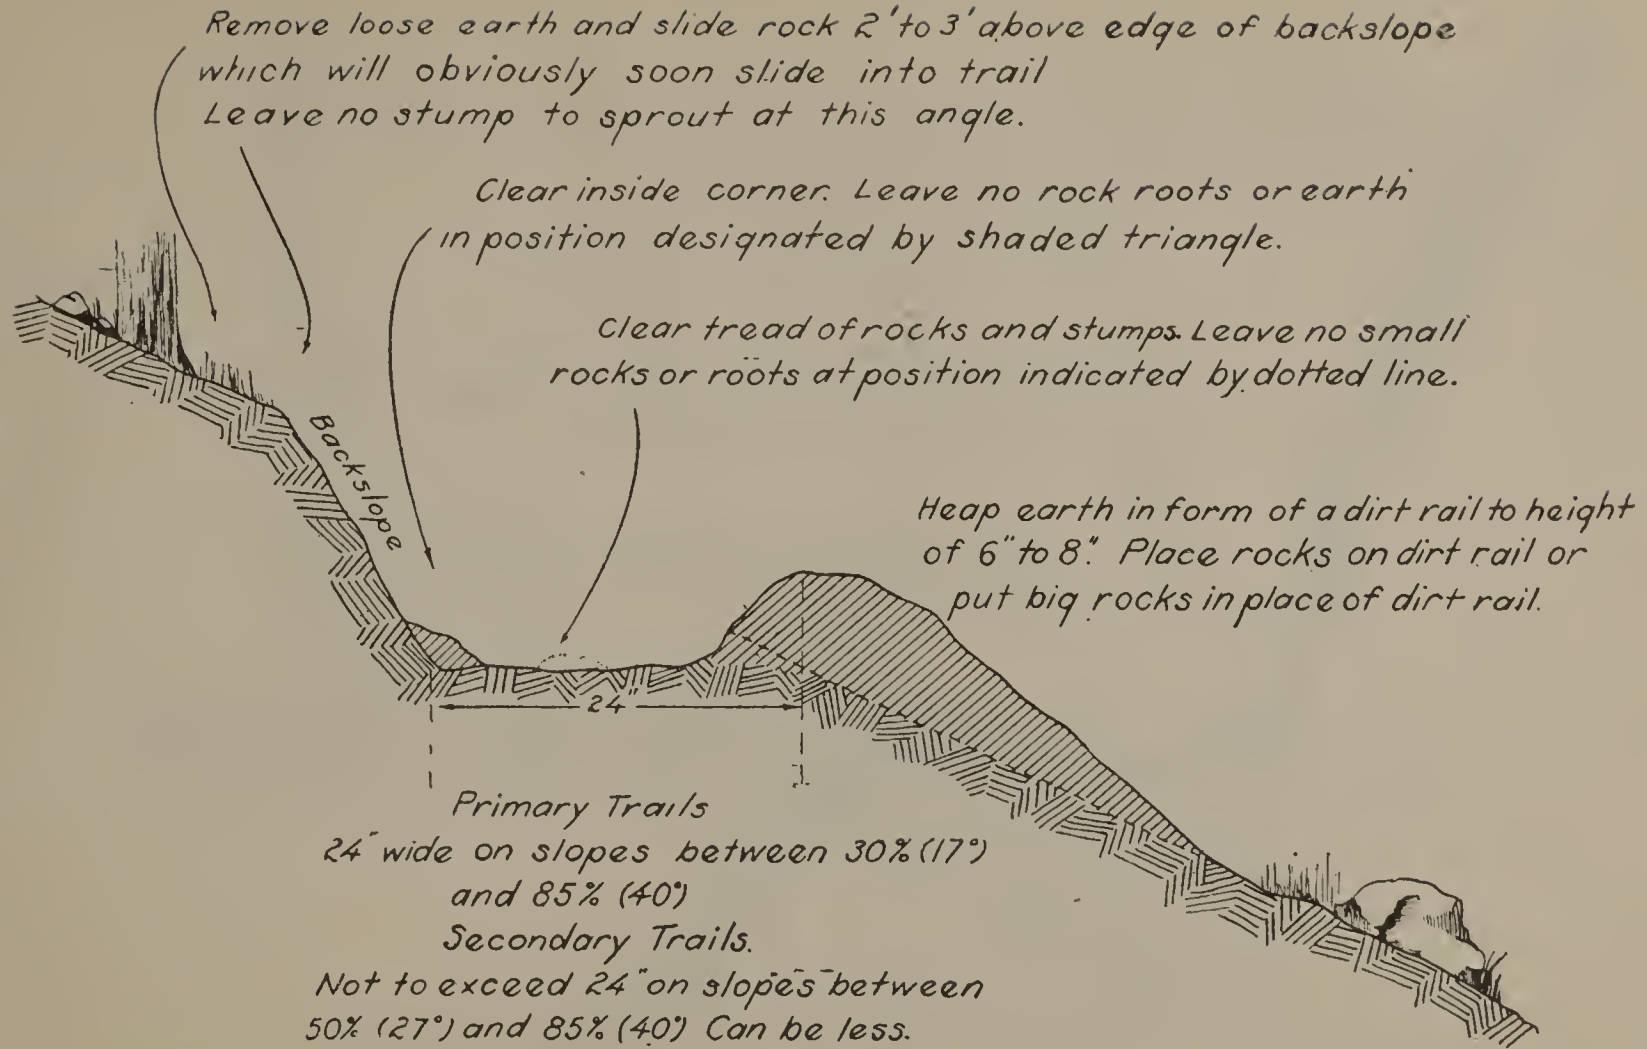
Cross section of typical trail in earth or shale rock on slopes between 30 per cent (17°) and 85 per cent (40°). (Par. 66.)
